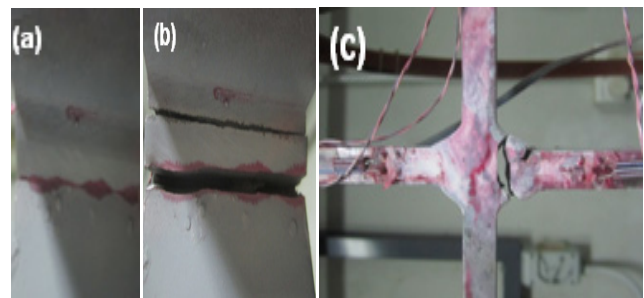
cracks on the surface leading to failure (a) Through crack (b) side view- complete fracture (c) front view- complete fracture.
